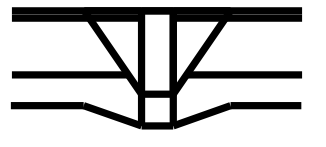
DETAIL SHOWING TYPICAL LOCATION OF CURB RAMPS, PEDESTRIAN CROSSWALKS AND STOP LINES FOR TEE INTERSECTIONS
